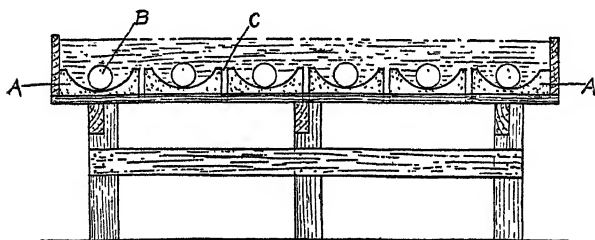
Greenhouse bench arranged for sub-irrigation. A, cement troughs on bottom of bench; B, drain tile or perforated pipes for supplying water; C, drainage spaces between troughs.
